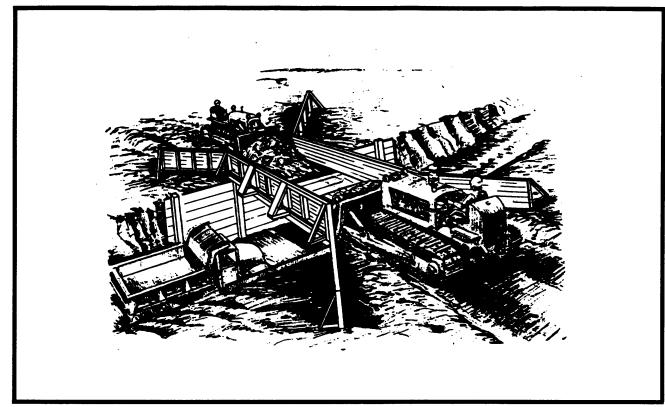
Double-End Trap, Truck-Drive-Through Loading Ramp
